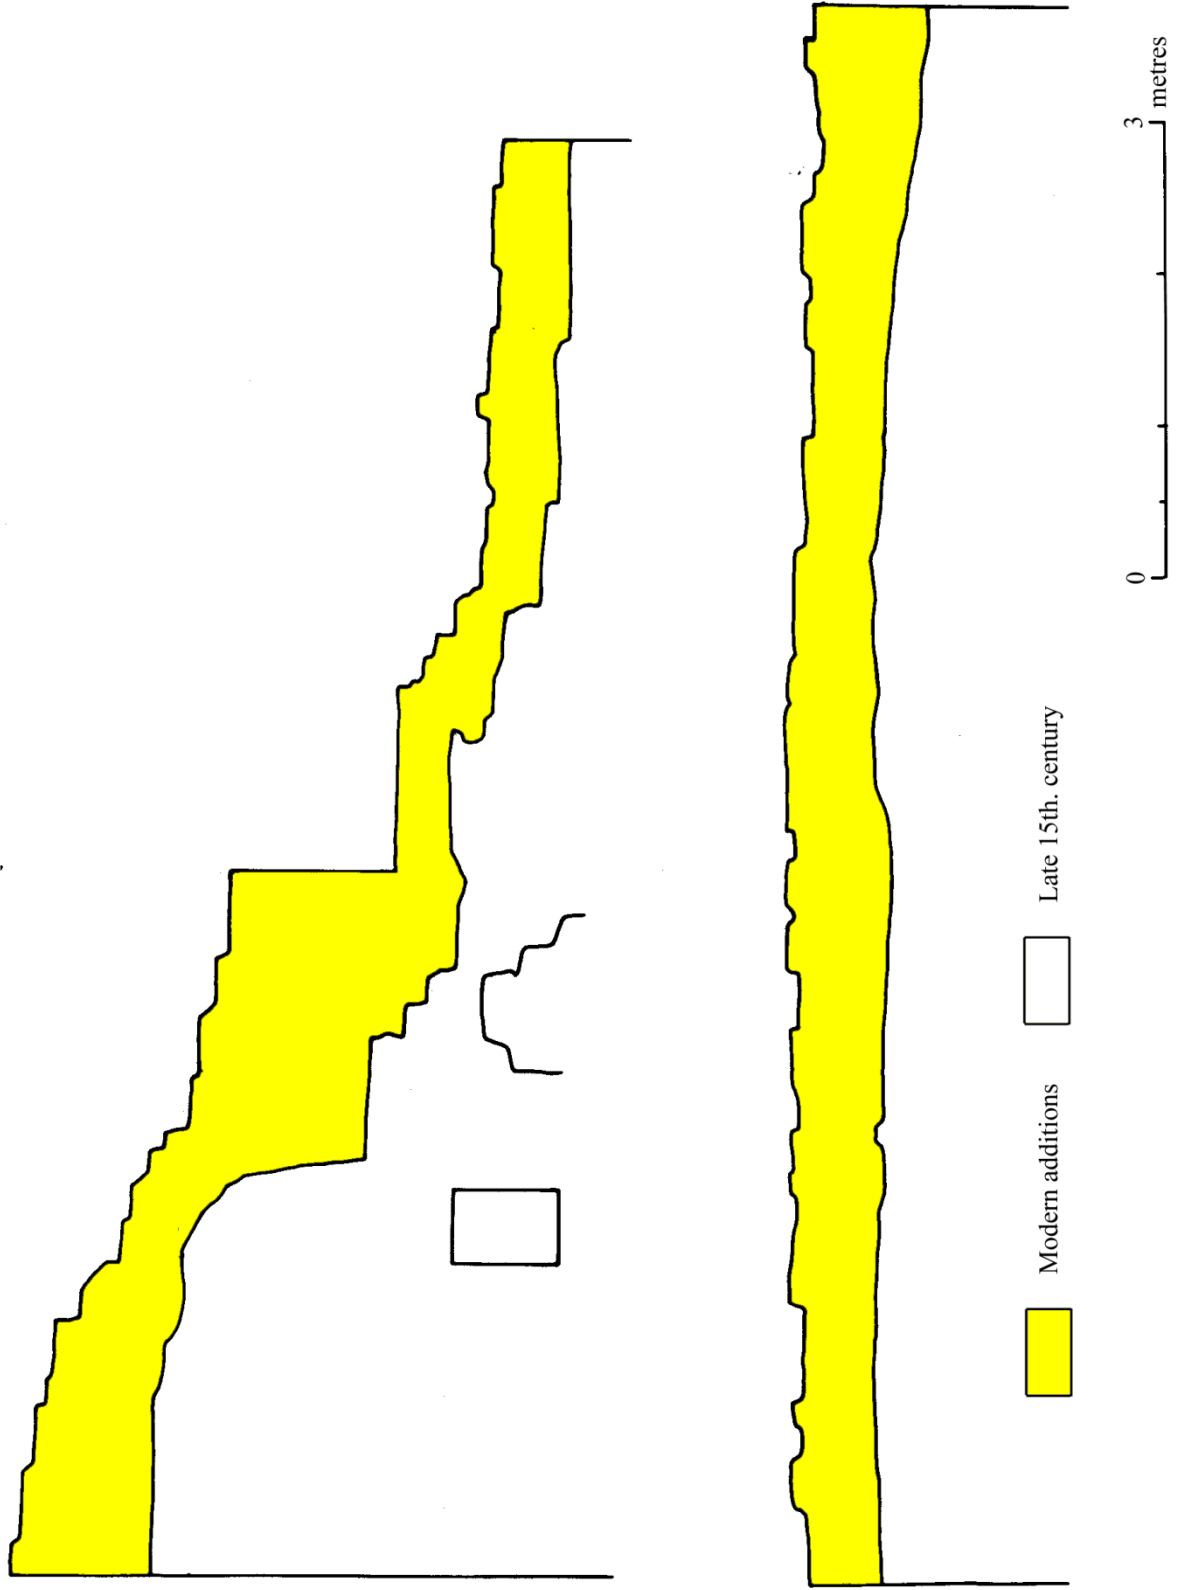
Eastern tower, east wall top, external (above) and north wall, external (below).
